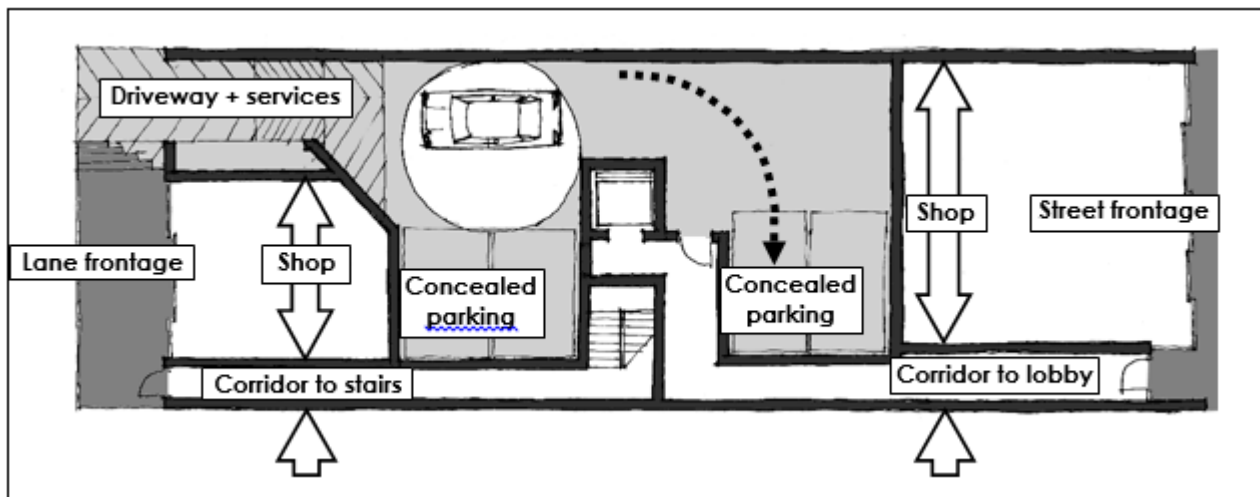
Site plan illustrating the minimum frontage allotment- A typical allotment fronting Terrigal Esplanade and Hudson Lane (layout subject to appropriate details and dimensions)
